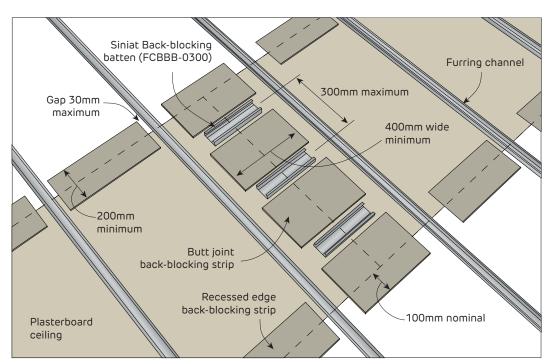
Placement of Back-Blocking Batten and Back-Blocking Strips for Recessed and Butt Joints
